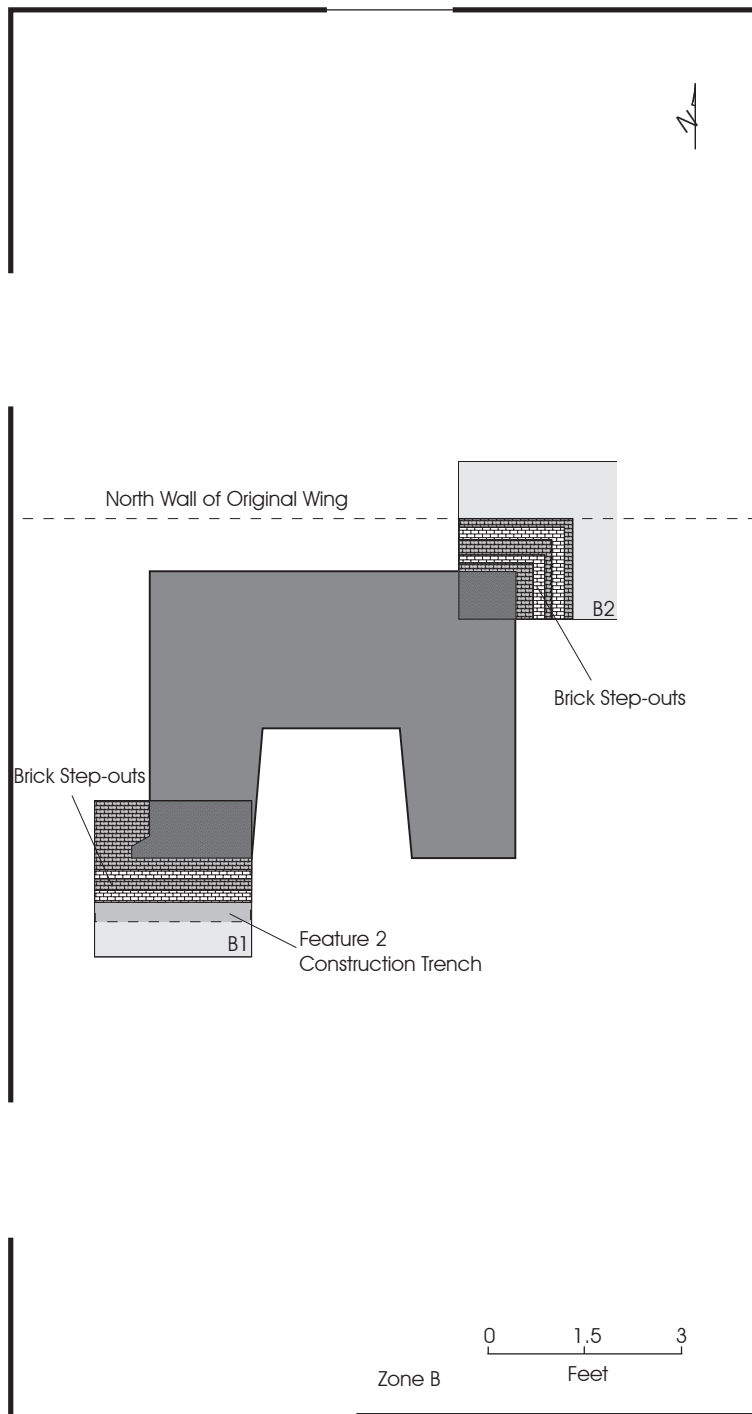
Illustration of Zone B showing brick step-outs and north wall of the original wing.
